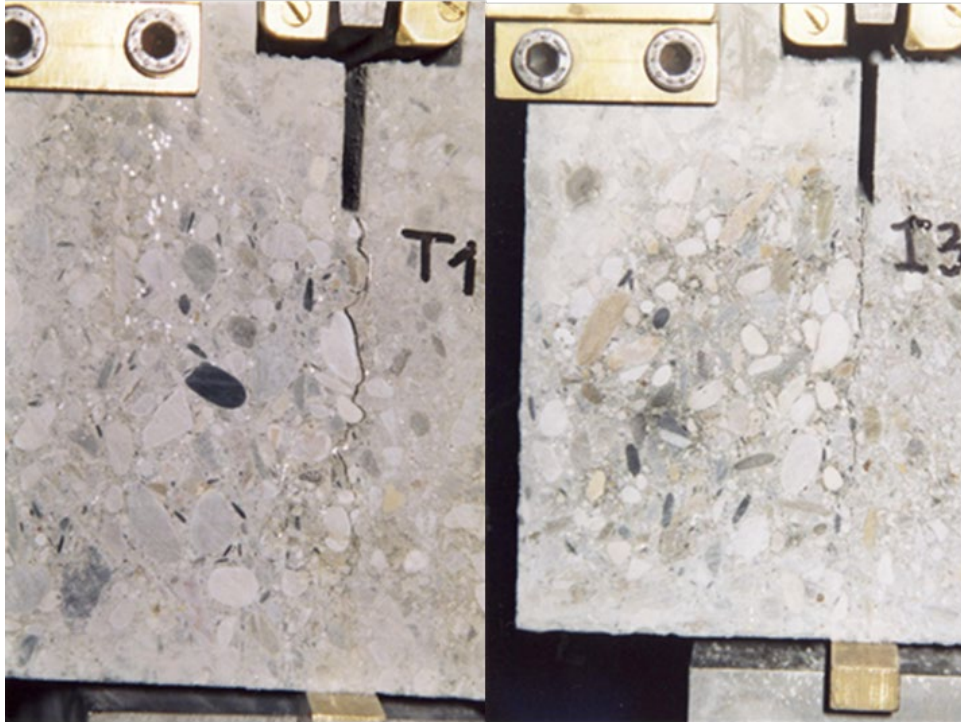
Surface photographs of concrete cubes after wedge splitting test: (a) concrete without mineral admixture, (b) concrete with added silica fume [16].
